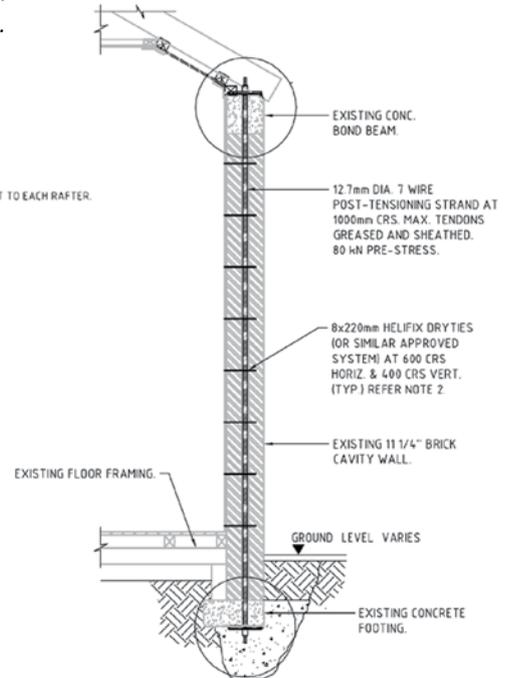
2014 Approved Plan - Double skin brick walls strengthening.
